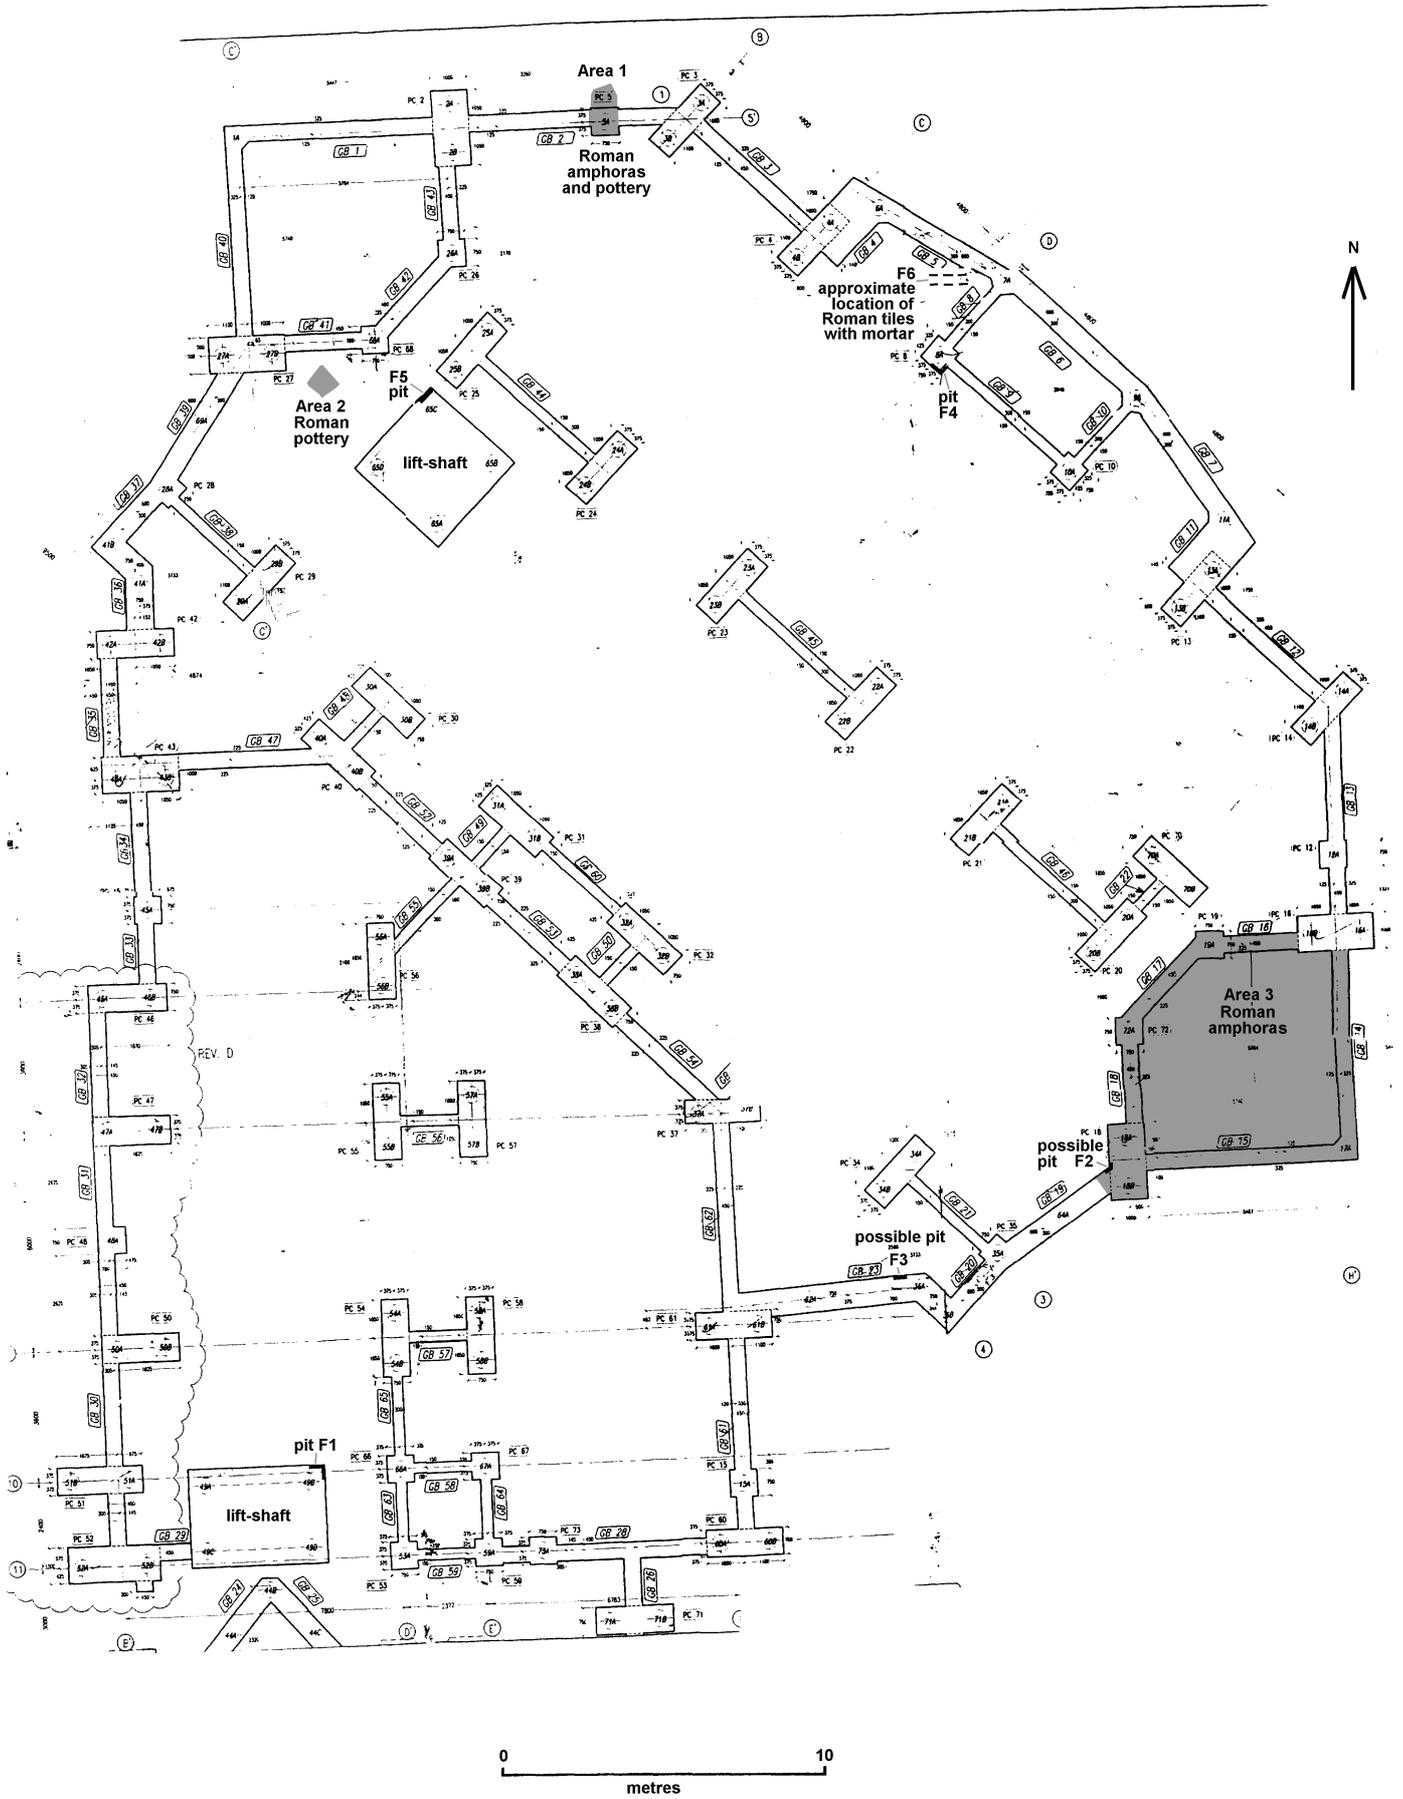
Site plan, showing locations of features and finds: scale 1:170.
